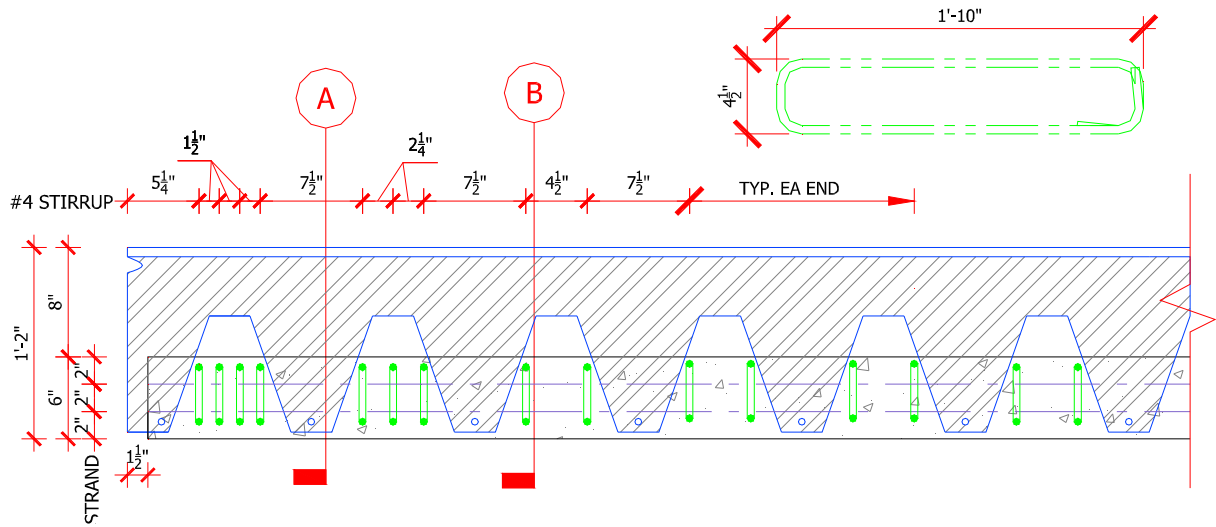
T-RECS Beam Elevation with Reinforcement
